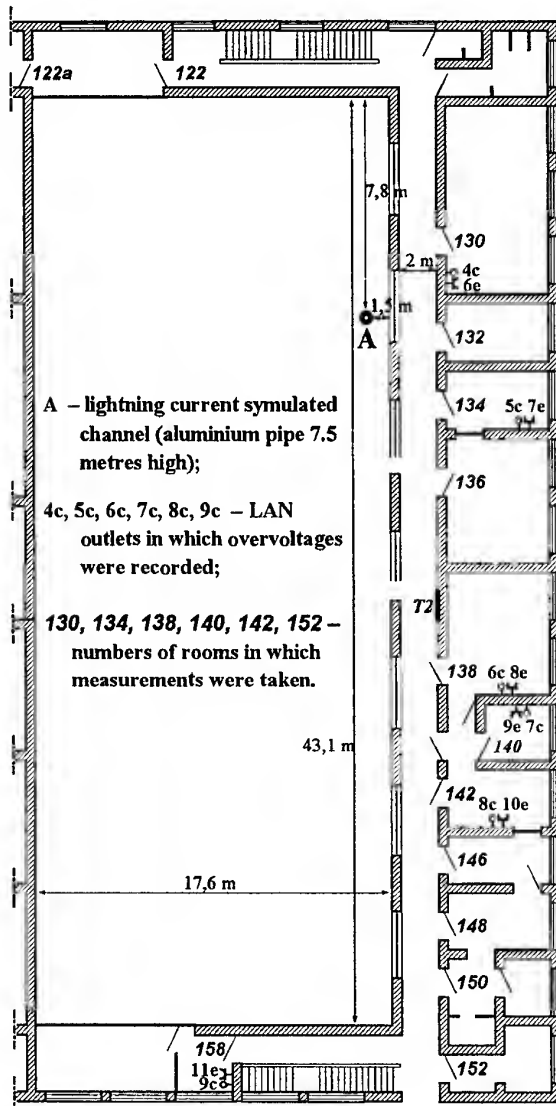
Fragments of the first floor in object with structural cabling system in which the measurements of the induced overvoltages were made. In rooms the measuring points (sockets) of structural installation were marked.
